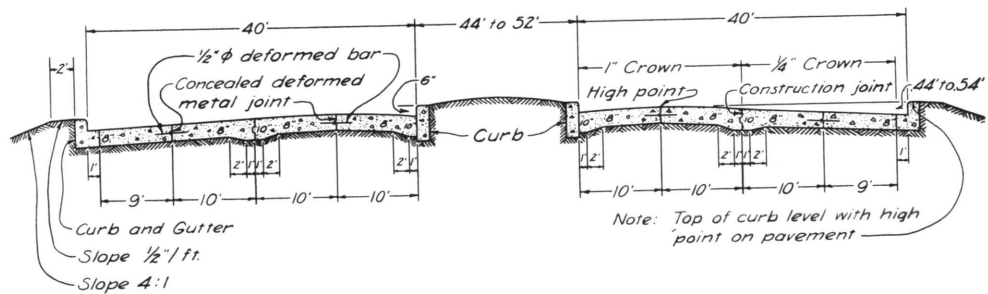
Photograph and typical cross section of Lake Shore Drive, Chicago.
